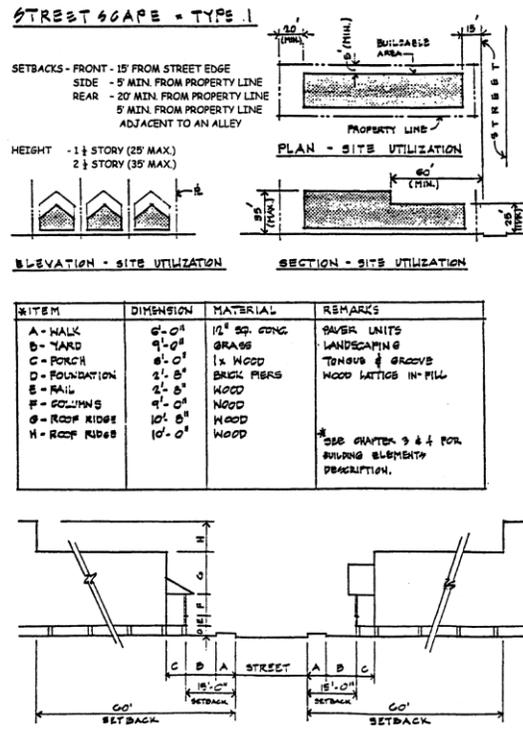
WOOD COTTAGES DISTRICT-STREETScape, TYPE 1
